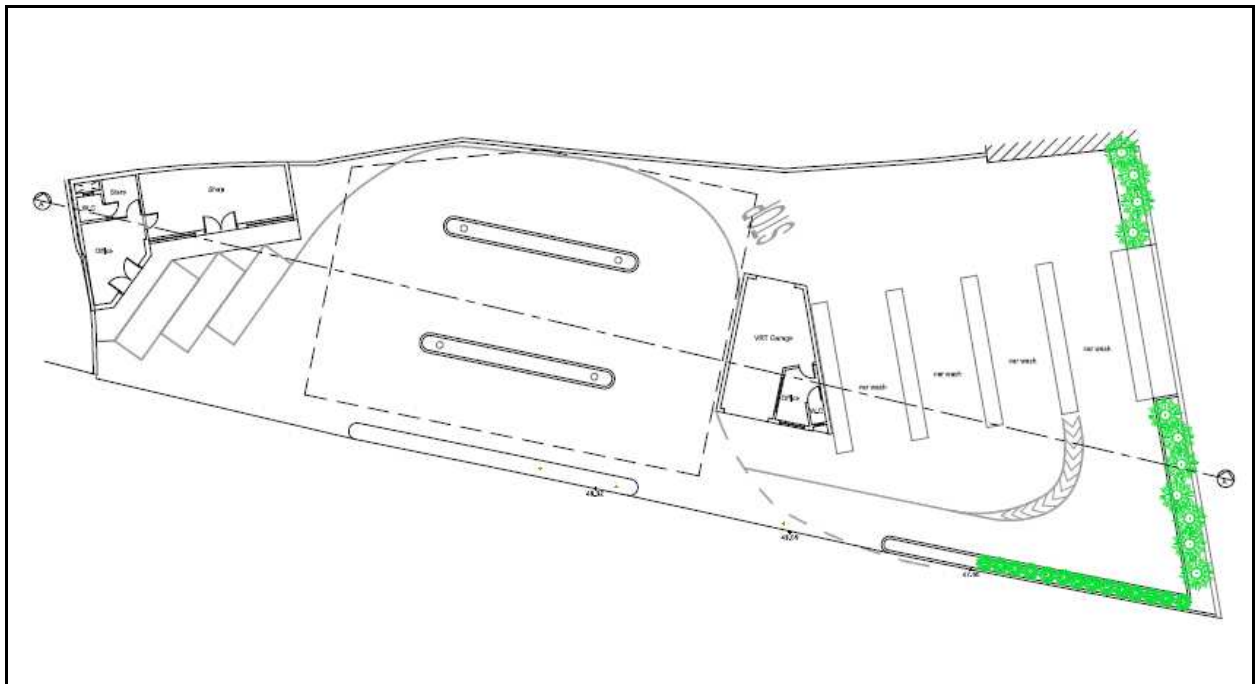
Proposed Block Plan (Doc. 45d in PA 04411/09)
